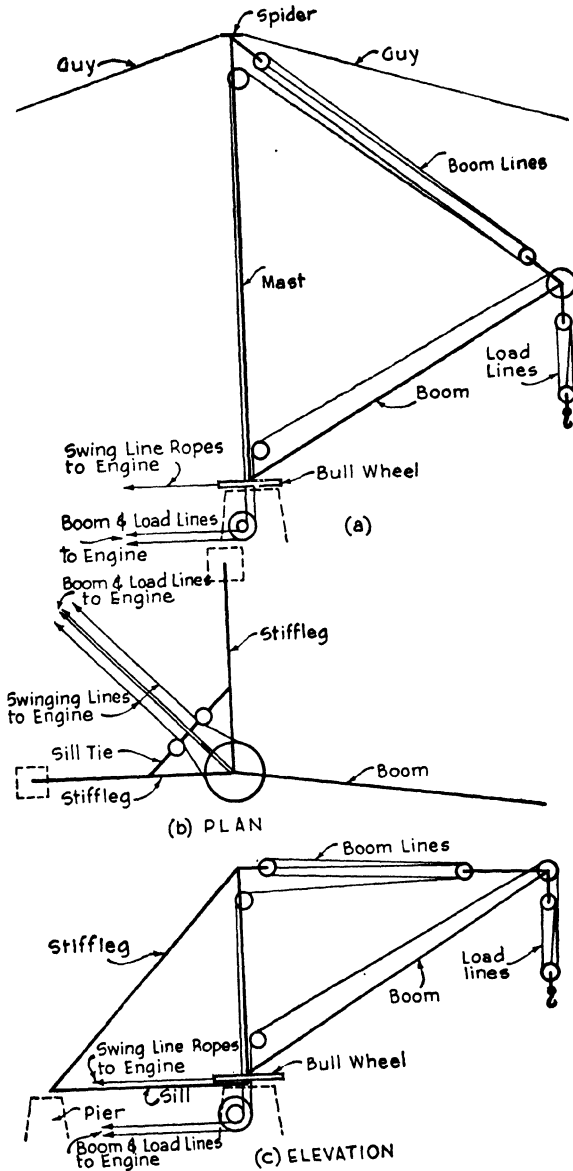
Reeving Derricks. (a) guyed derrick; (b) stiff-leg derrick, plan; (c) elevation. (Courtesy Insley Manufacturing Co.)
